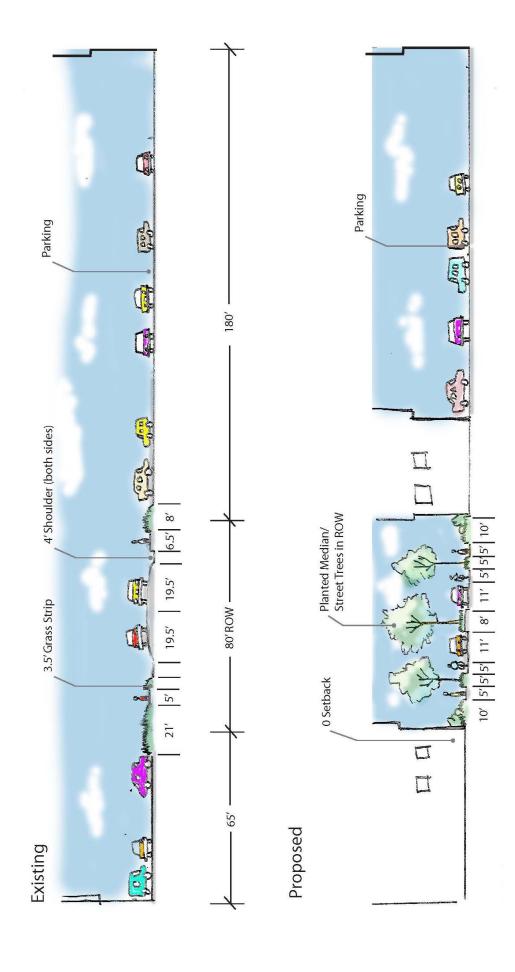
Figure E: Existing and Proposed street cross section east of Forest Road/Route 28 intersection.
